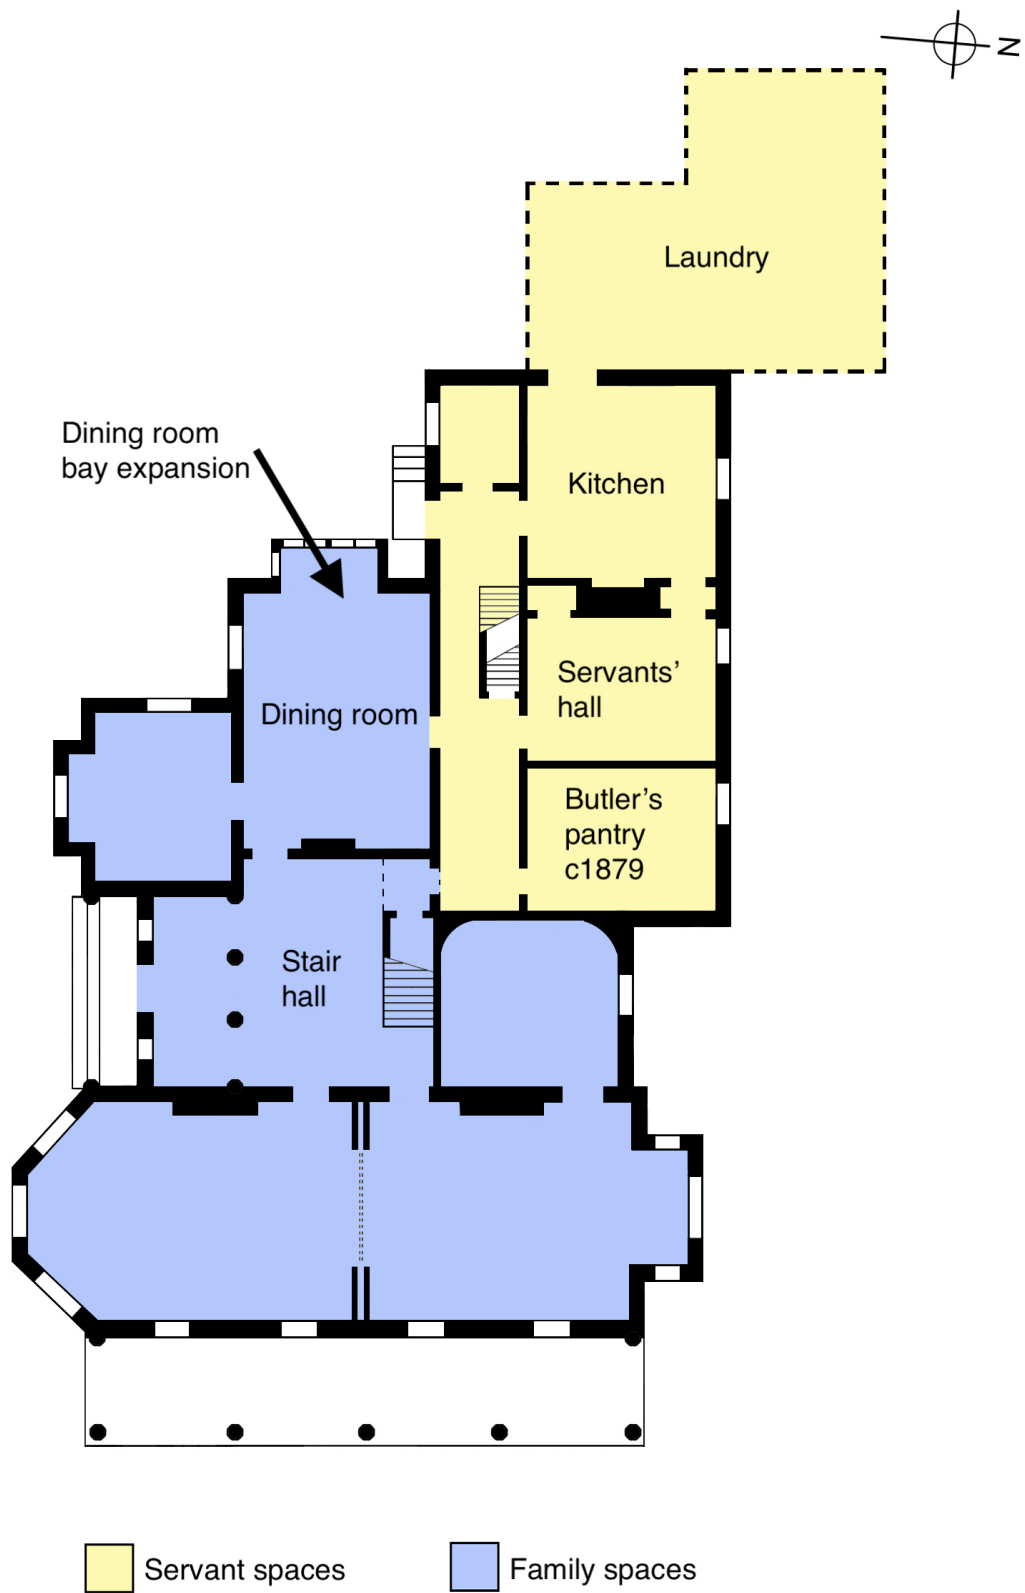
Kingscote 1878 Phase 2 ground floor plan
